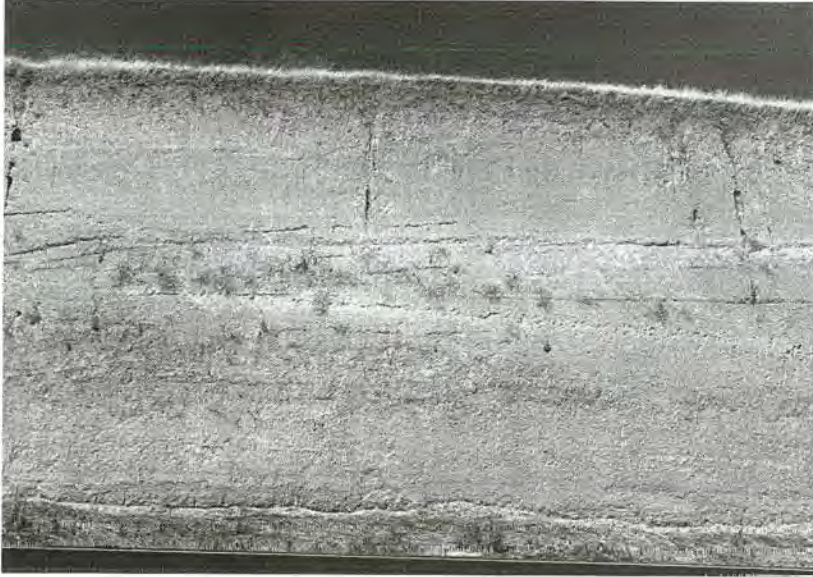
Minimal erosion damage where natural surface drainage is away from slope face (east of Walla Walla, Washington).
